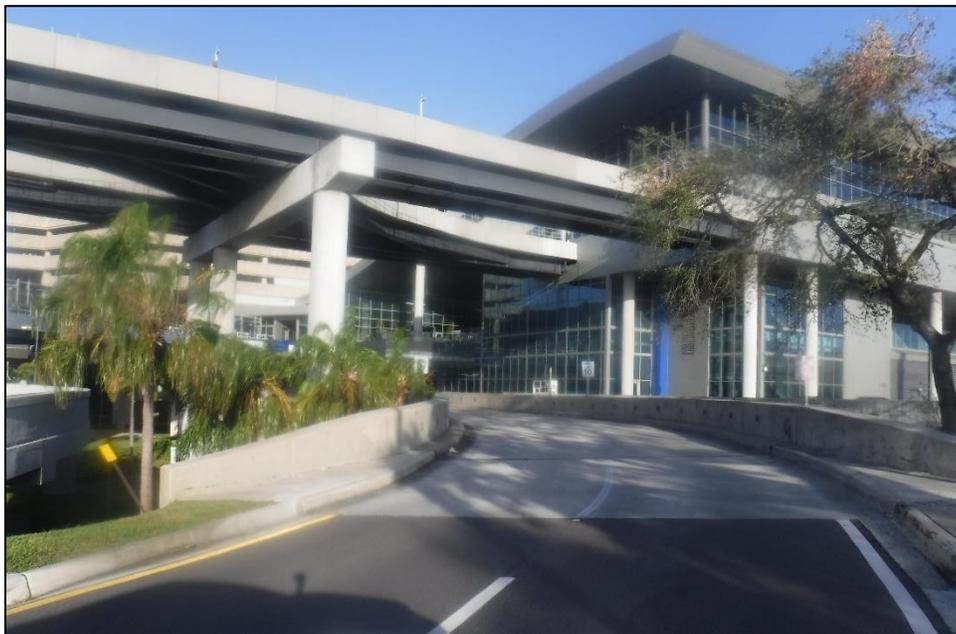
Bridge No. 109907/8HI15838, facing Northwest
